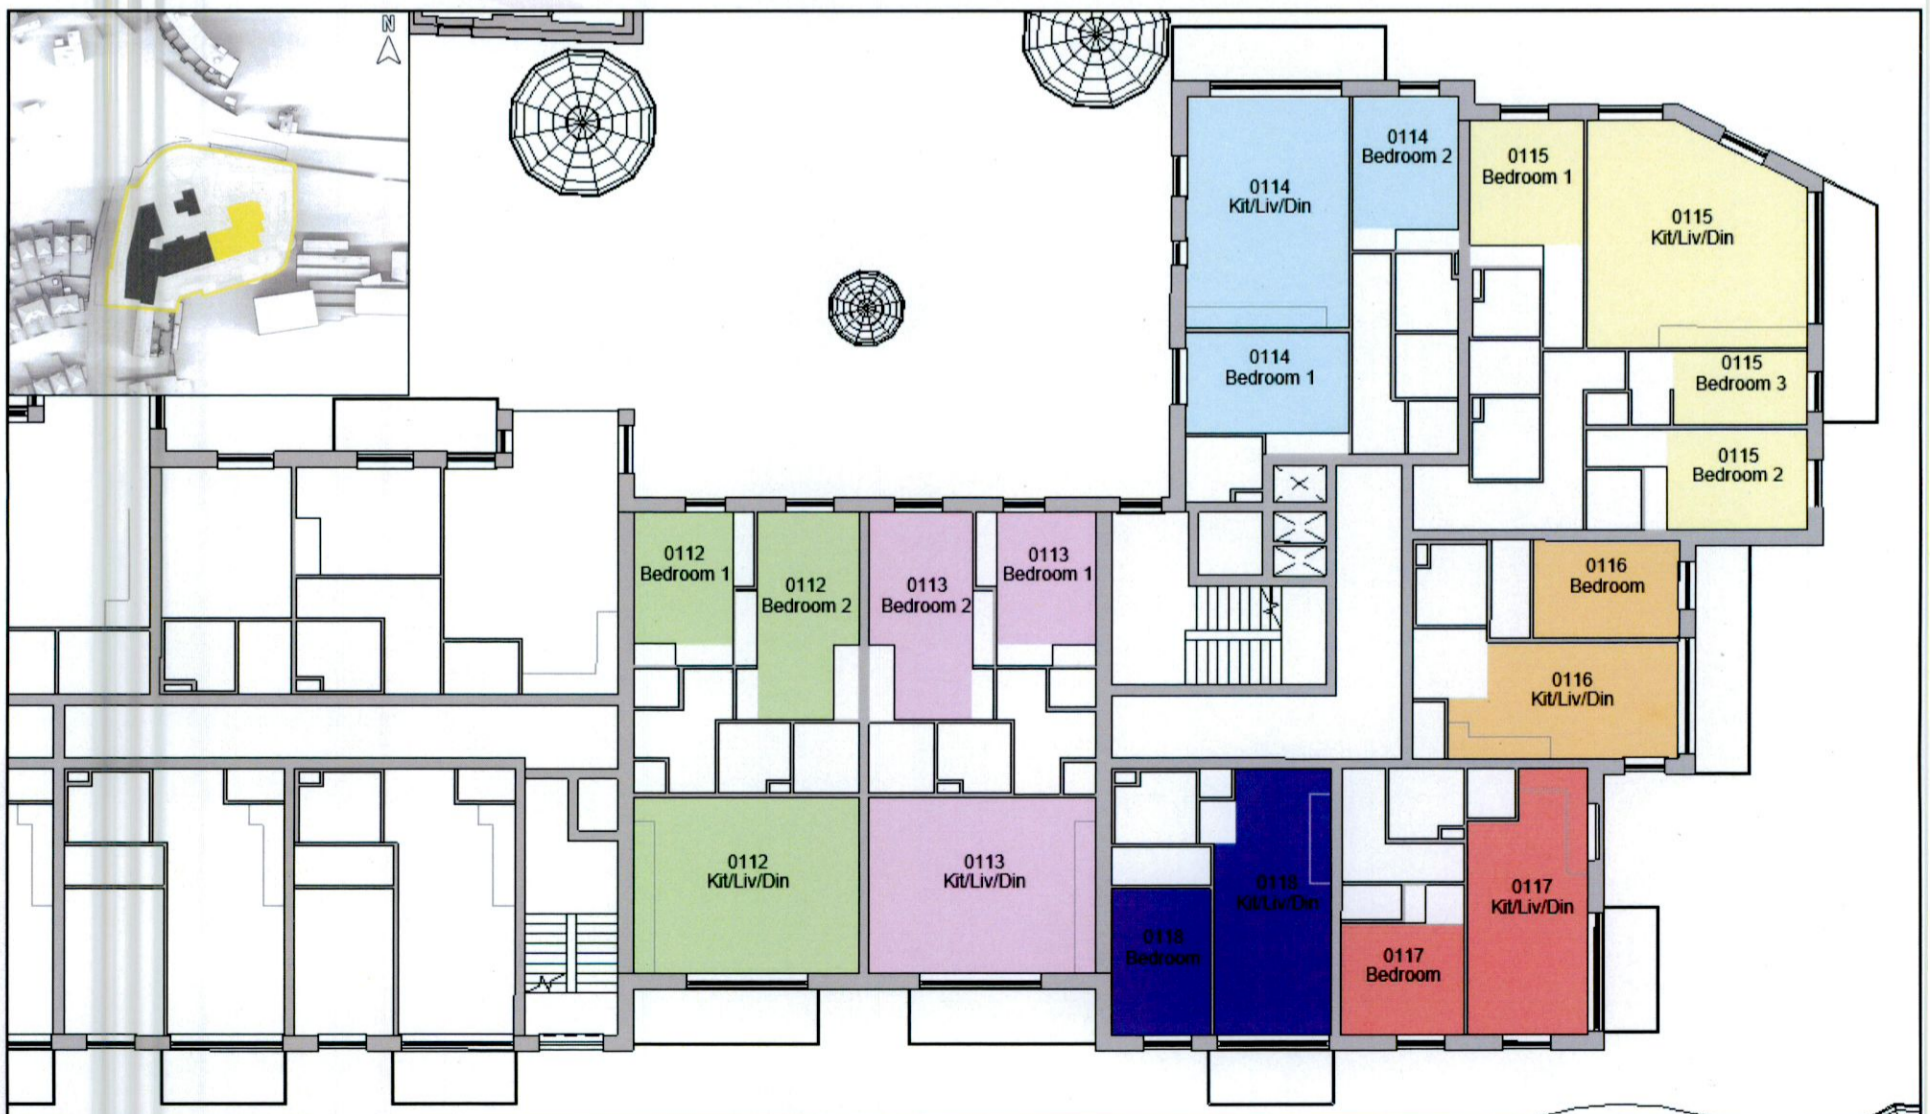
Floor plan of assessed building (R), Keyplan highlighting the assessed building (L).
